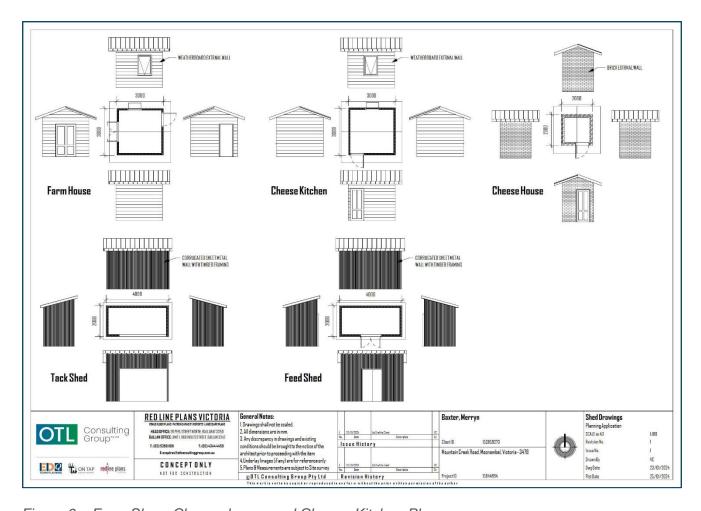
Farm Shop, Cheese house and Cheese Kitchen Plans
